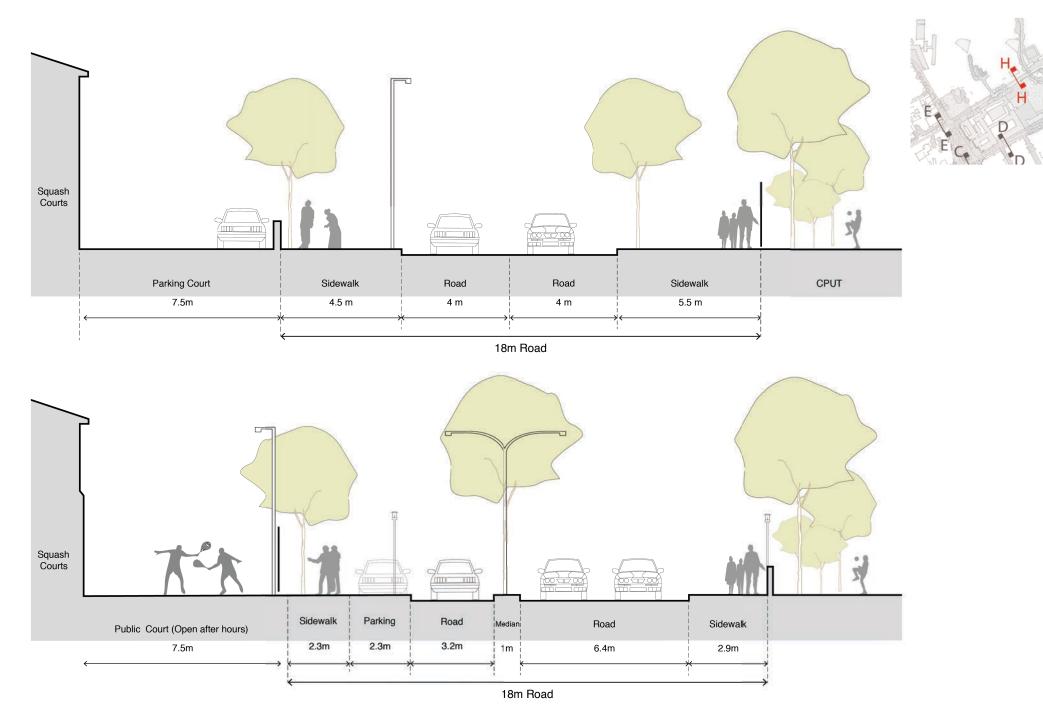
PENTZ UPPER STREET SECTION: SECTION HH
